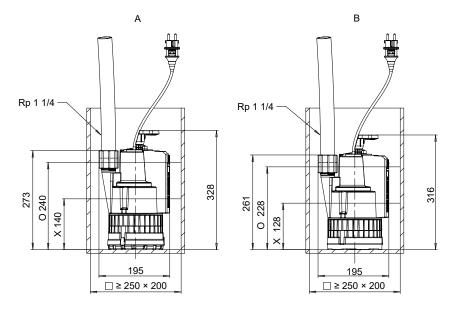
Dimensions of AmaDrainer 303 [mm]
